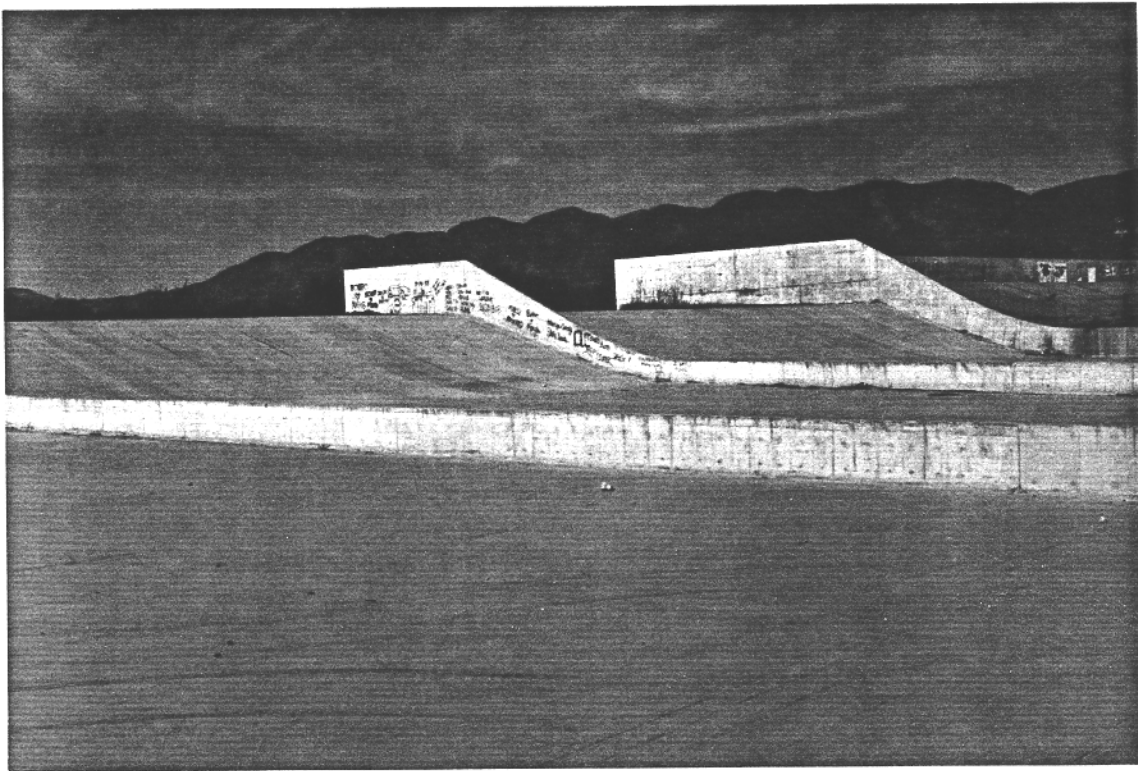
Lytle Creek East Branch Inlet Looking NE. On Right Is The Spillway Levee At Elev. 1160 Ft. Added Onto The Original Bypass Spillway When The East Branch Channel Was Modified. Top Of Levee Wall Is At Elevation 1160 Feet.
